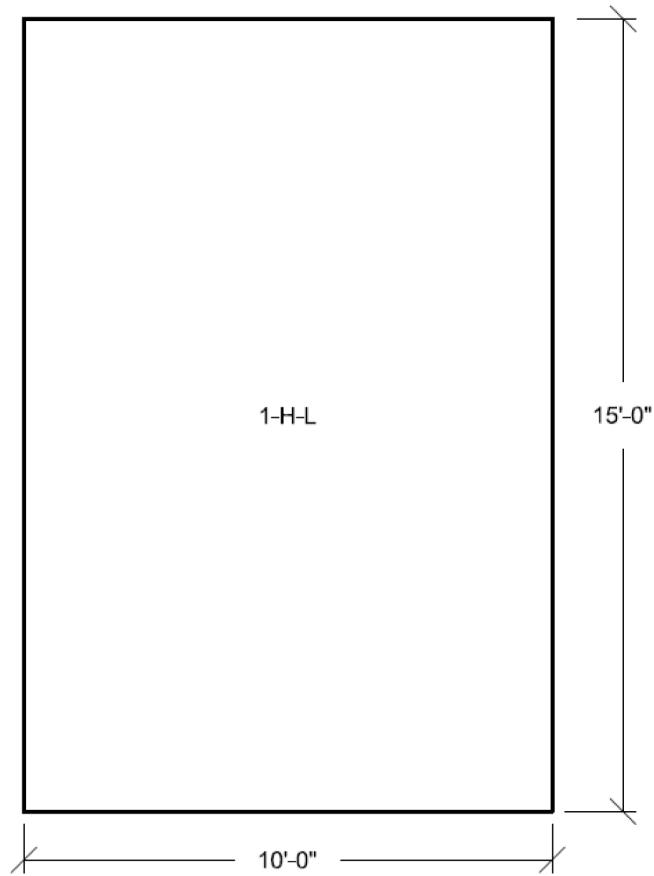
H.6-202 DGFOSV Wall 15 Looking From Outside
